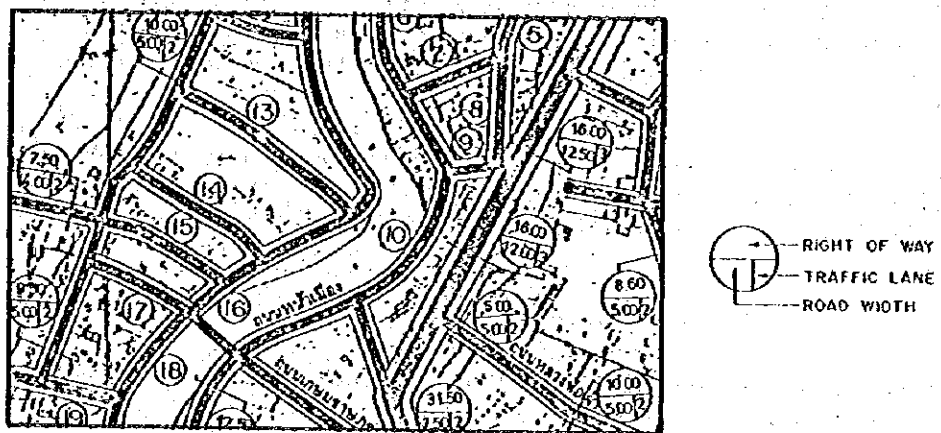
Right-of-Way, Road with A Traffic Lane (Example)
